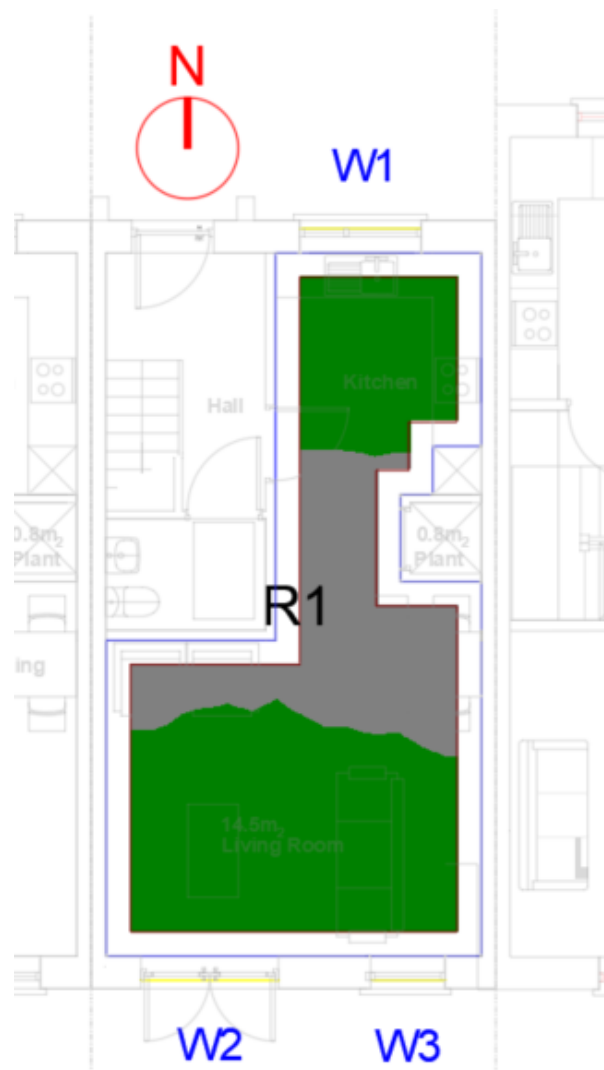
Proposed Ground Floor sDA Contours of House G-02 2-054
